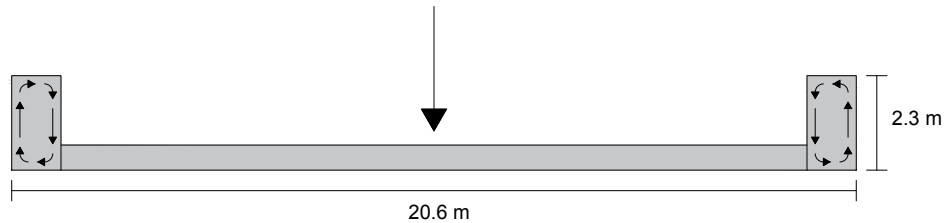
Shear loading from torsion in the side girders of a trough bridge
